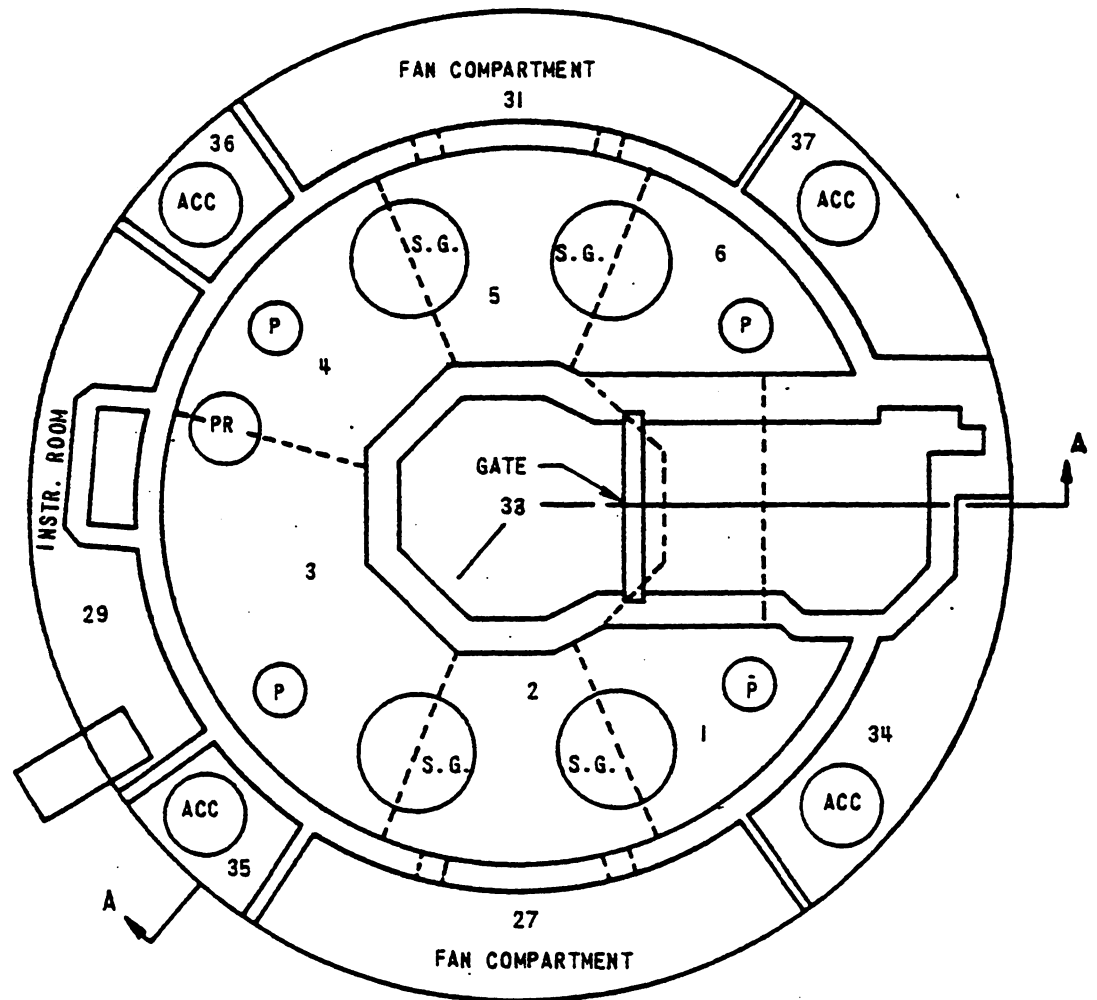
Plan at Equipment Rooms Elevation
